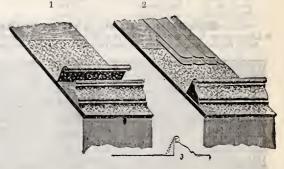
shows Face Moulding to which Gutter is to be attached. Fig. 2 shows Face Moulding and Gutter locked together and in position.
